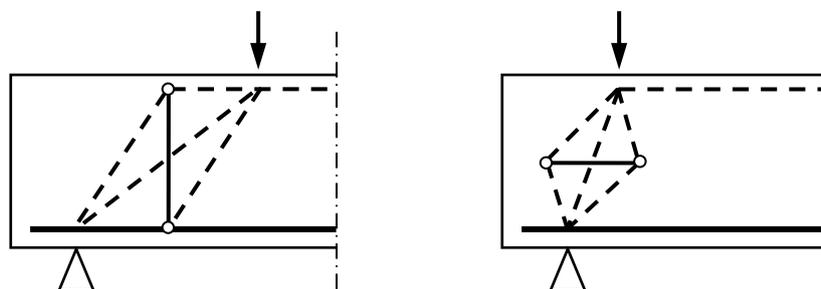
Betongföreningen (2010a) suggests that horizontal reinforcement should be placed instead of vertical stirrups, if the load is applied closer than $0.5d$ to the support.
